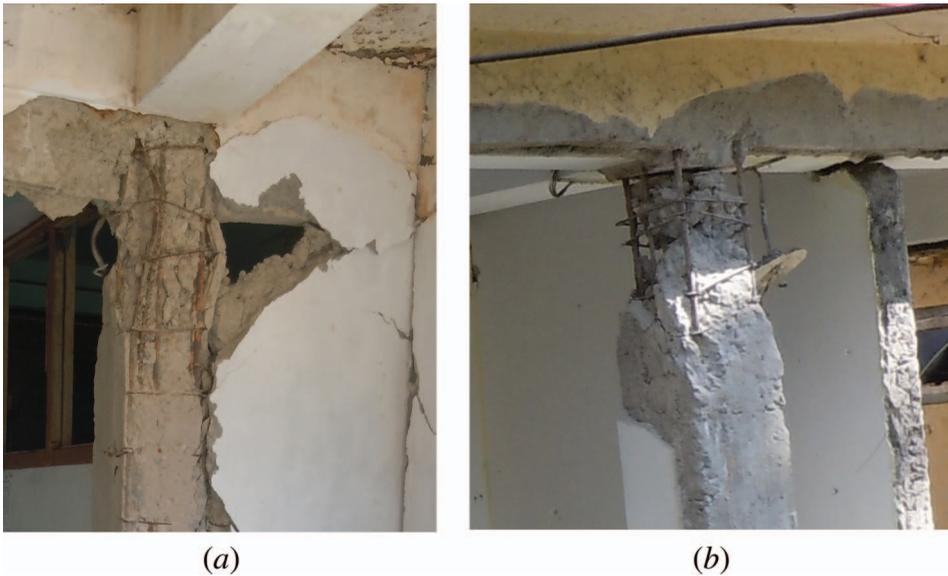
(a) and (b) Typical failure at column ends (widely spaced stirrups with 90° hooks, cold junction at the column top, poor concrete quality).
